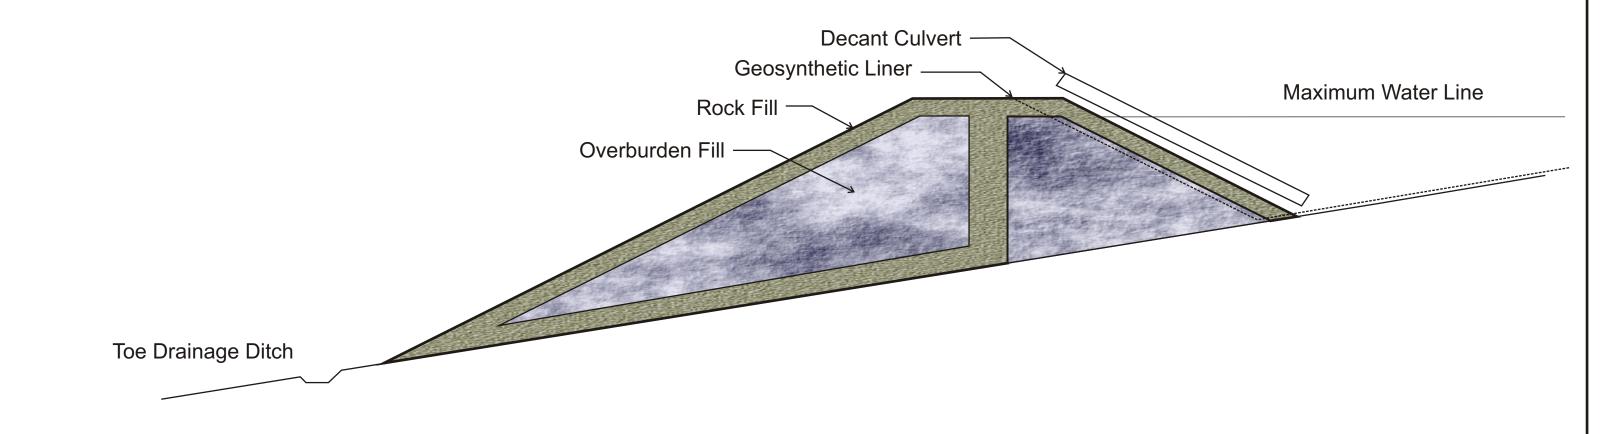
(Tailings Dam Cross Section) demonstrates the construction cross section of the tailings dam.
